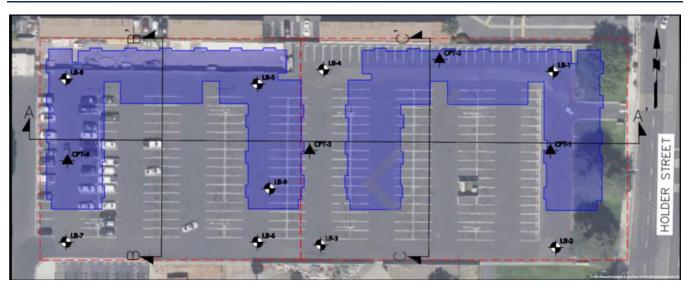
Subsurface Boring Locations at Proposed Student Housing Area (Langan 2022, Figure 7).
